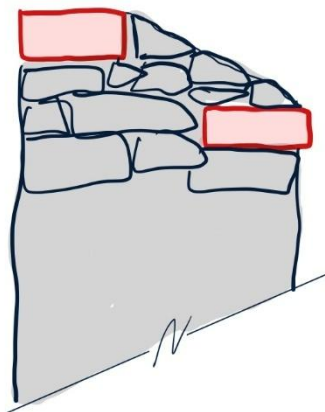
Likely wall top detail to be discovered below the vegetation. Brick on edge to east face (lhs) and brick on flat corbel to west face (rhs).
